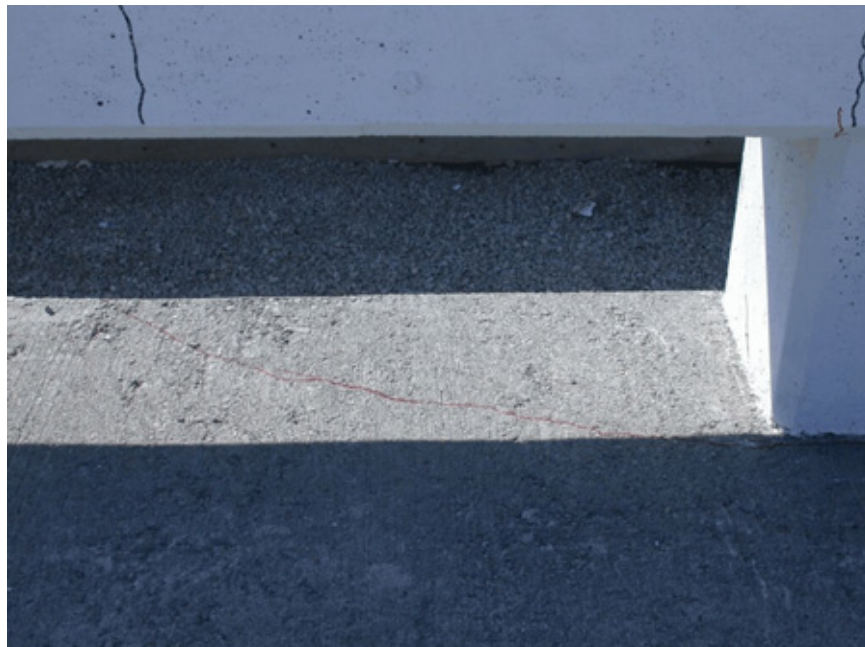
Bridge Deck Damage Around Post No. 7, Test NIT-1
